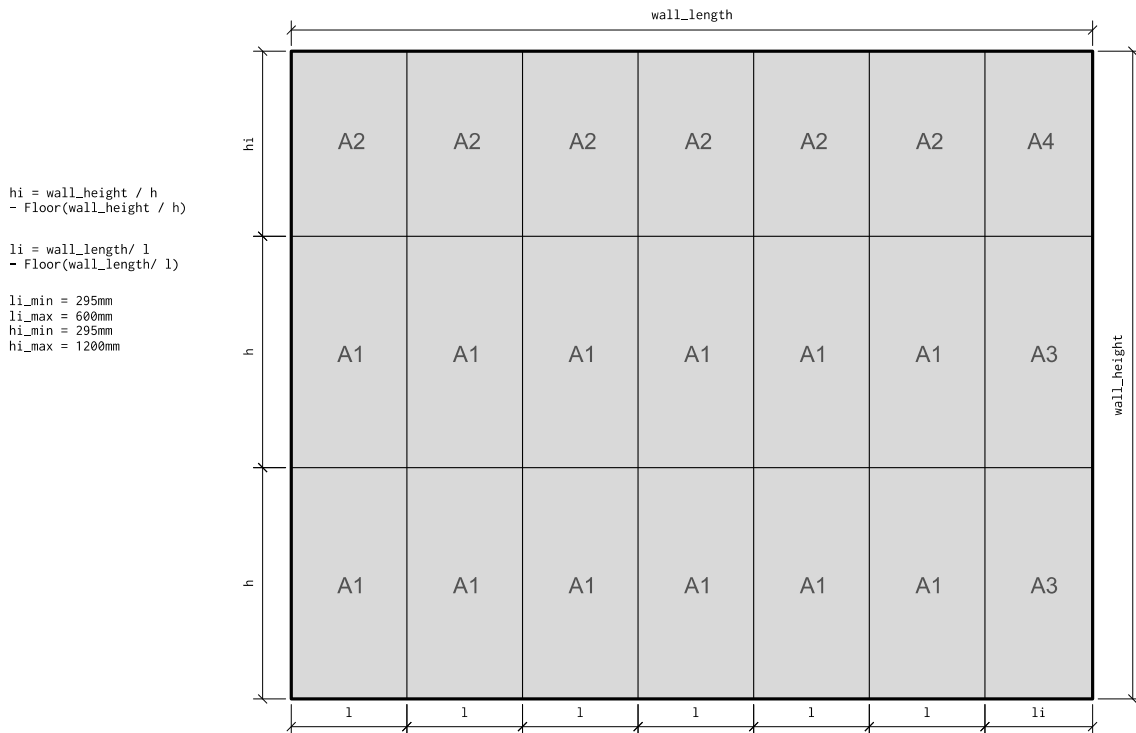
ORW v4.0 typical elevation with metric dimensional subdivision and functional subdivision
